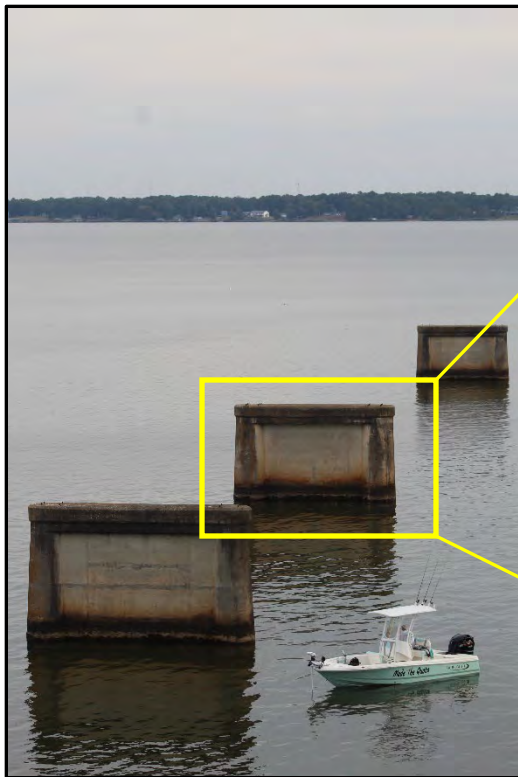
Standalone bridge sections west of the US 301 bridge. Each structure is constructed with 6 concrete piles.
